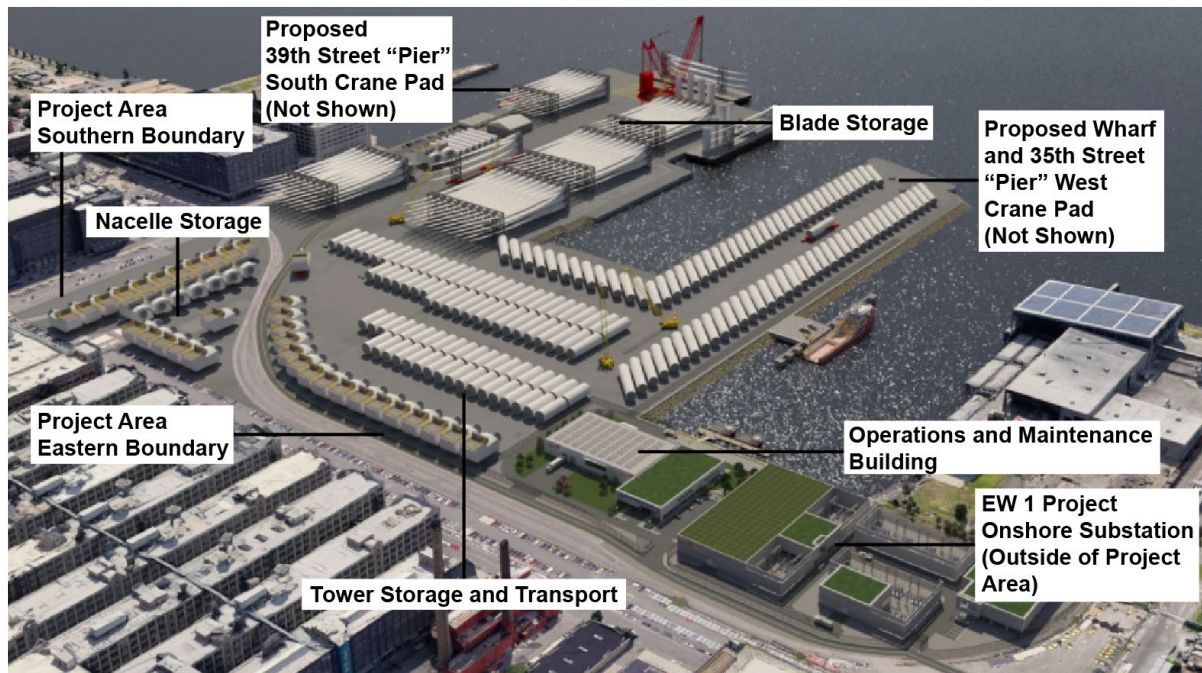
Proposed Project Site Plan – Conceptual
